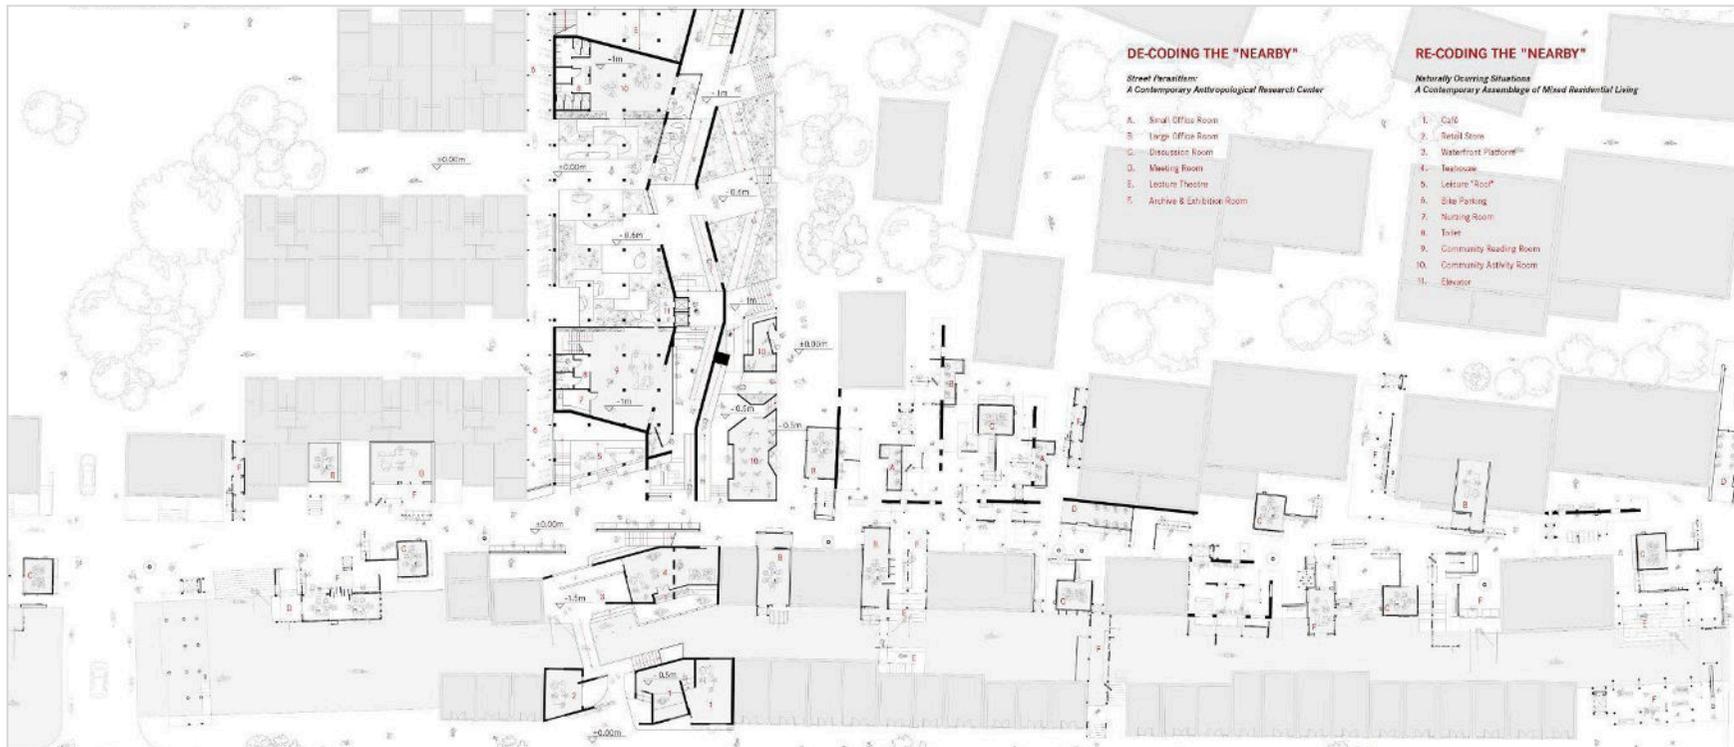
FYP Ground Floor Plan. Shucen Liu (2023).
